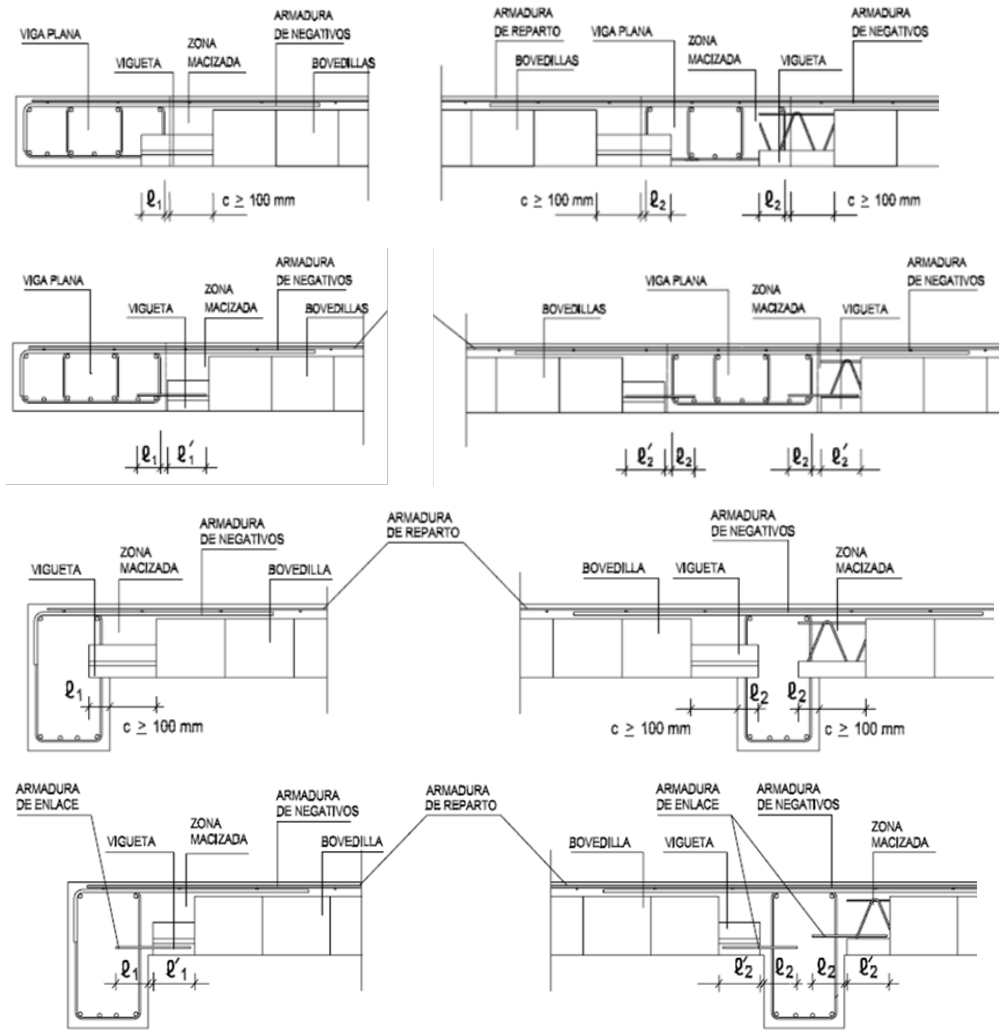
Support layouts given in the EHE standard for precast-prestressed joists
